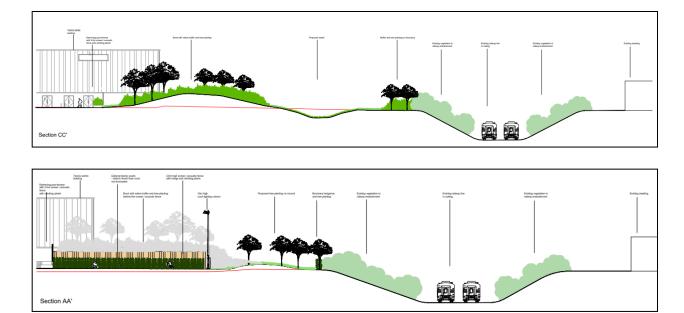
Cross Section Showing the Tennis Centre Building/Proposed Earth Works/Landscaping/Railway Cutting and Highwinds
